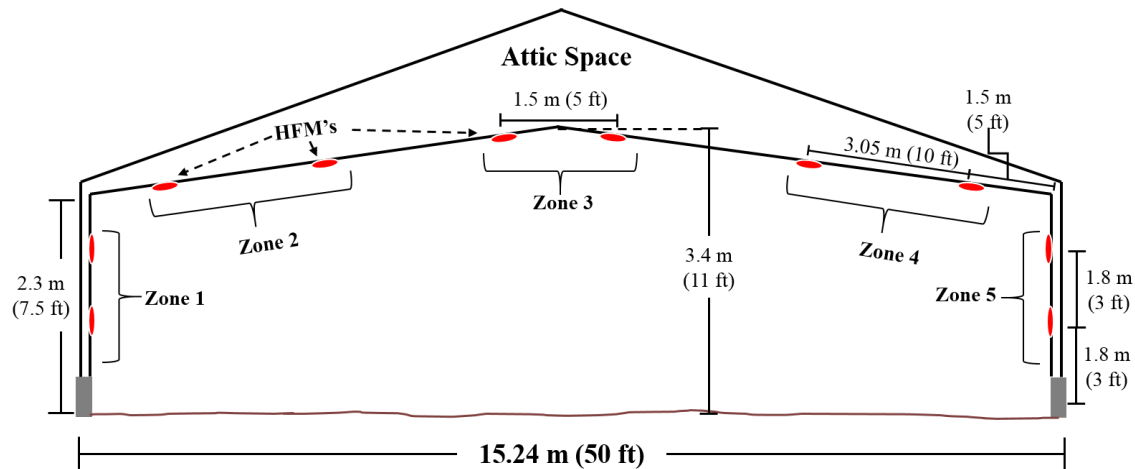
Side view illustration of broiler house cross sectional dimensions and layout of HFM locations and measurement zones for both House A and B.
